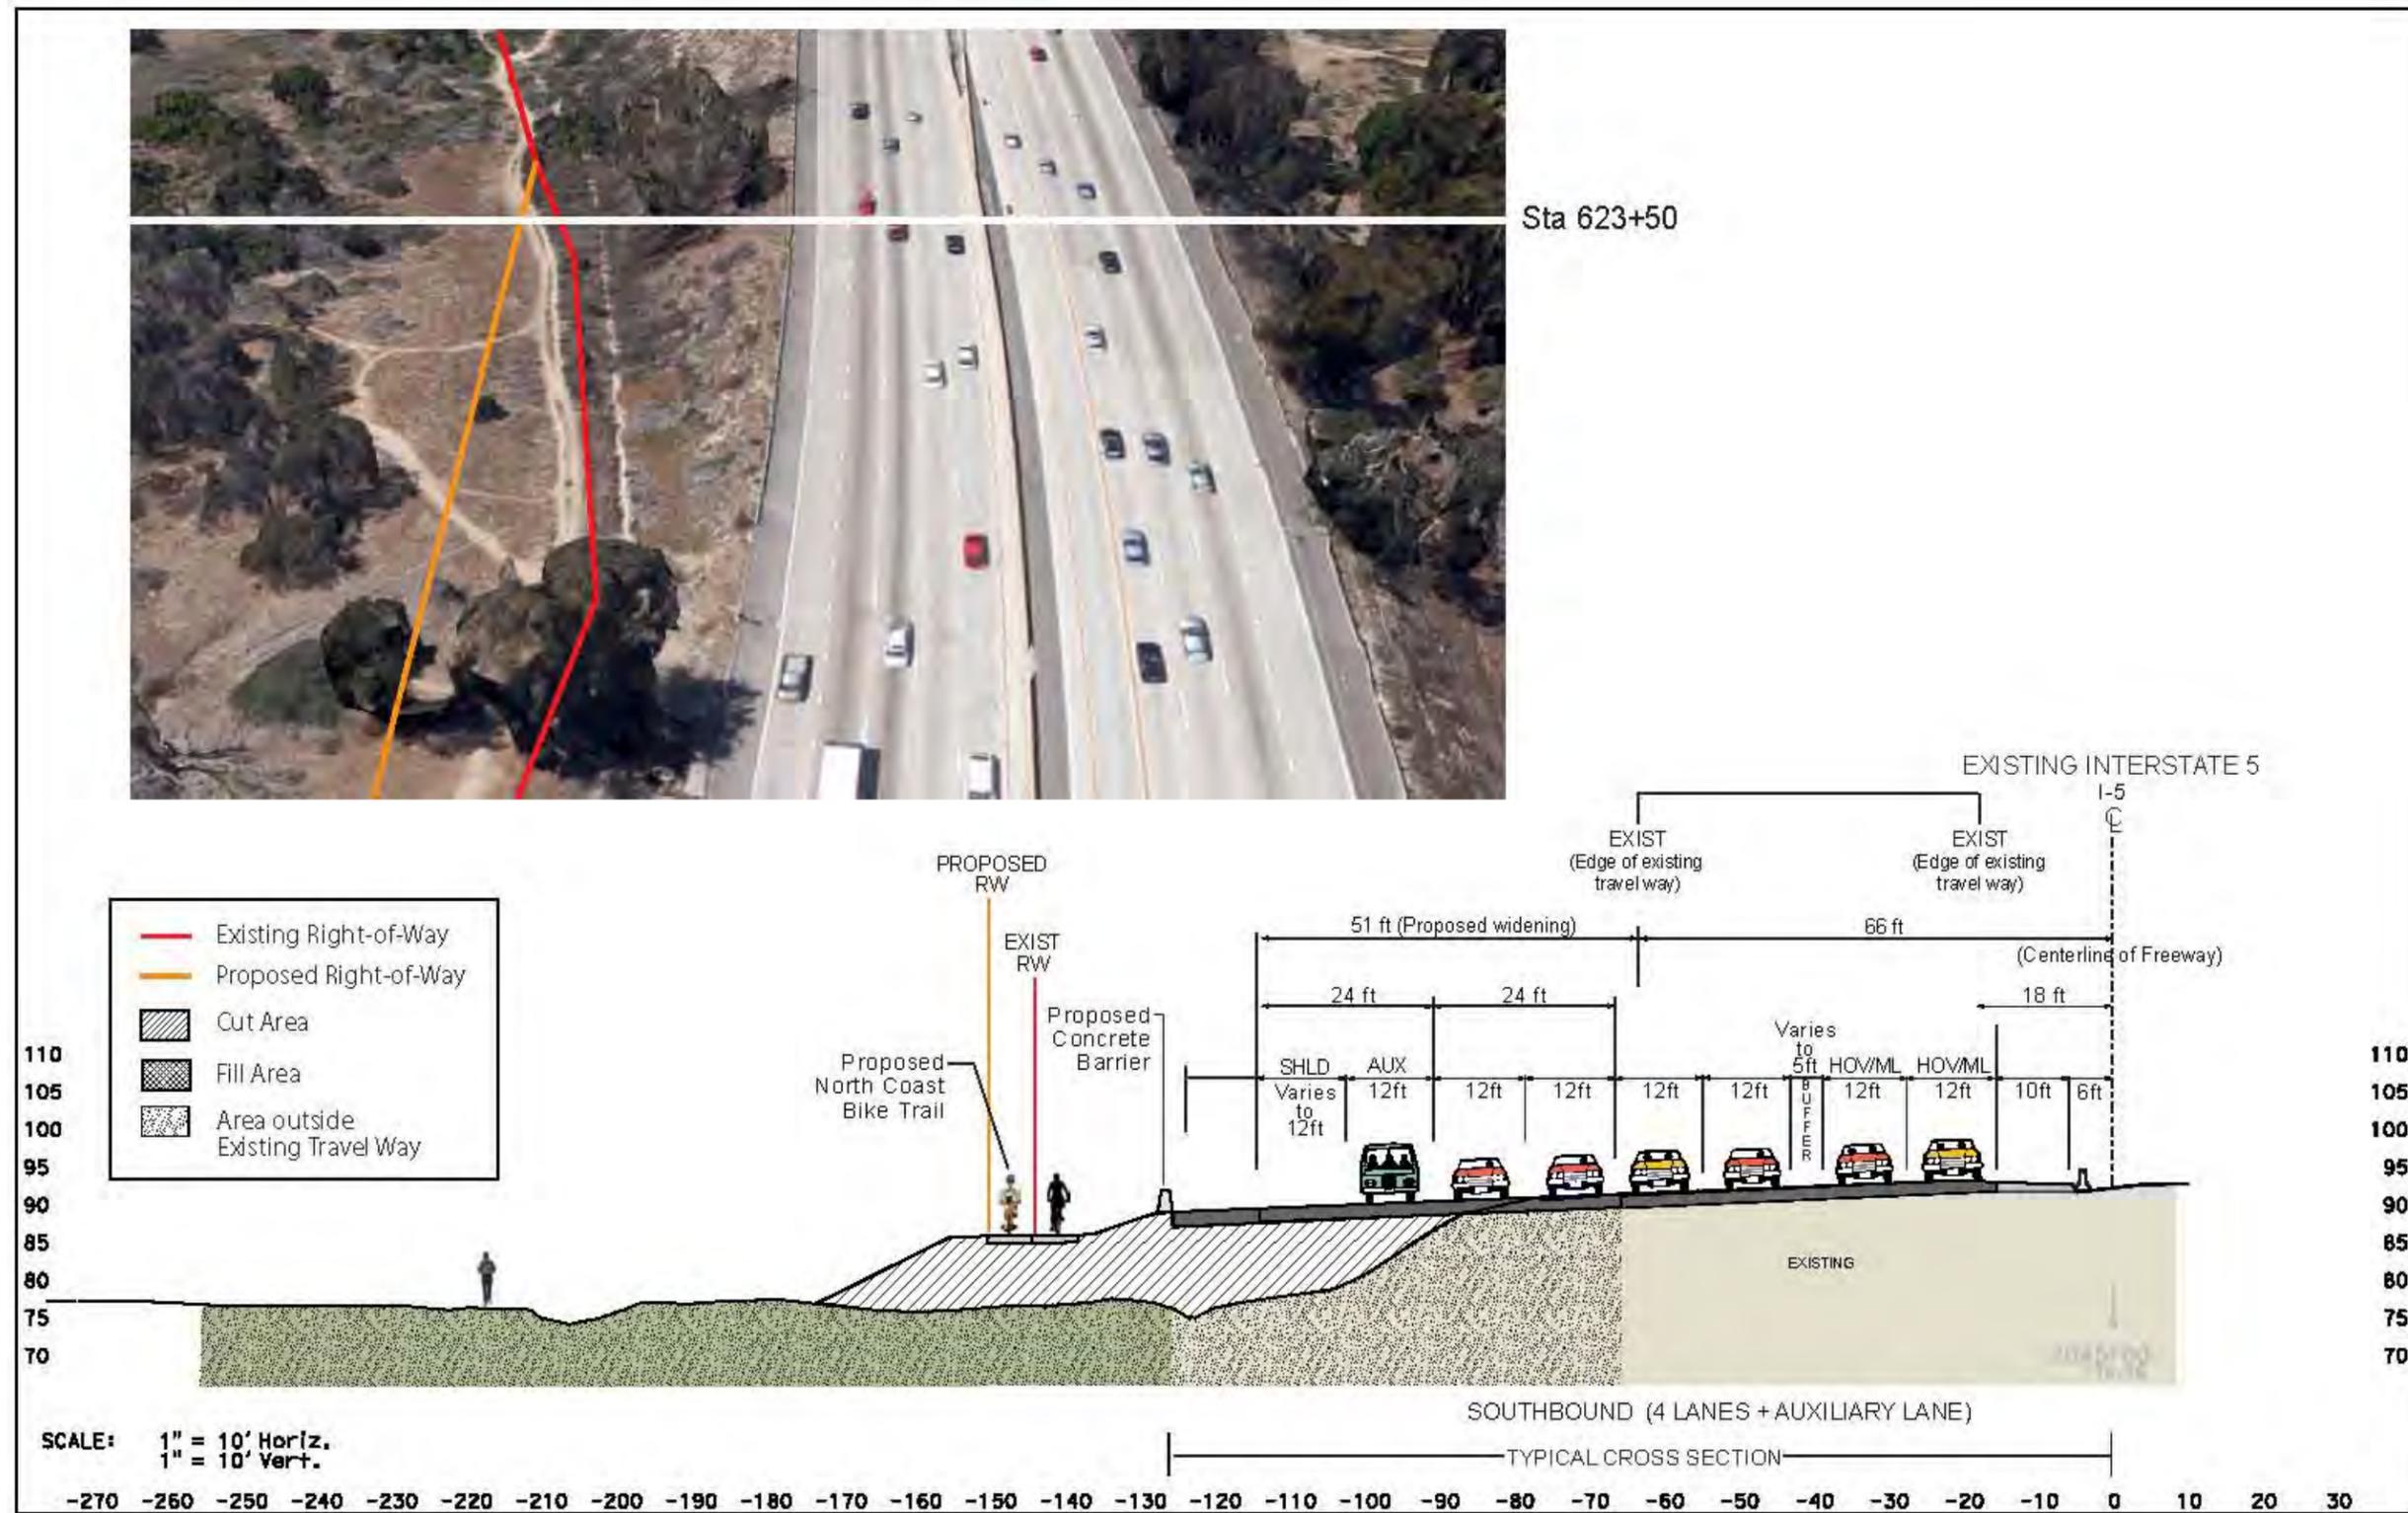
Preferred Alternative Cross Section at Sta. 623 + 50
